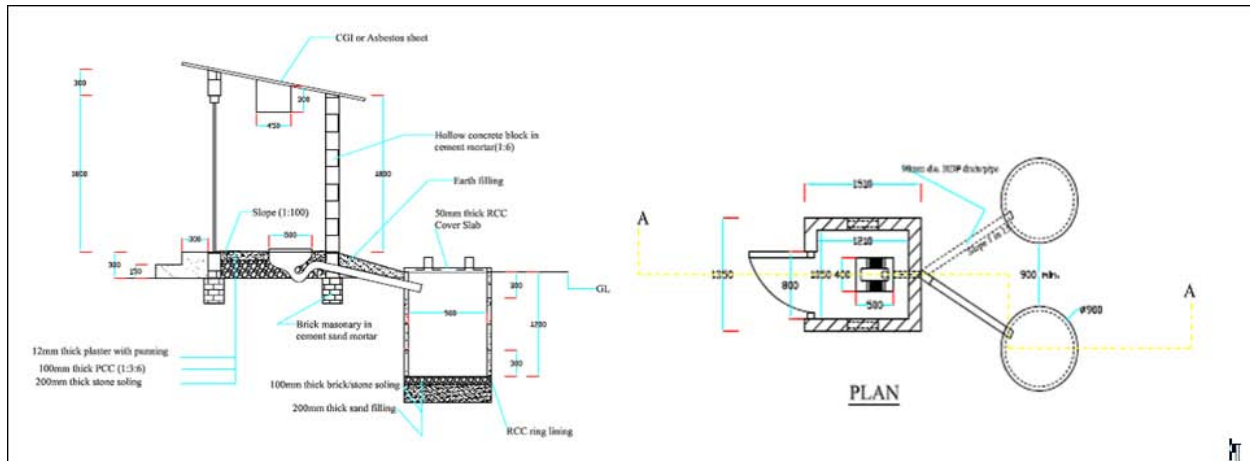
Water seal offset type double pit of RCC lining and plan (source: DWSS)
